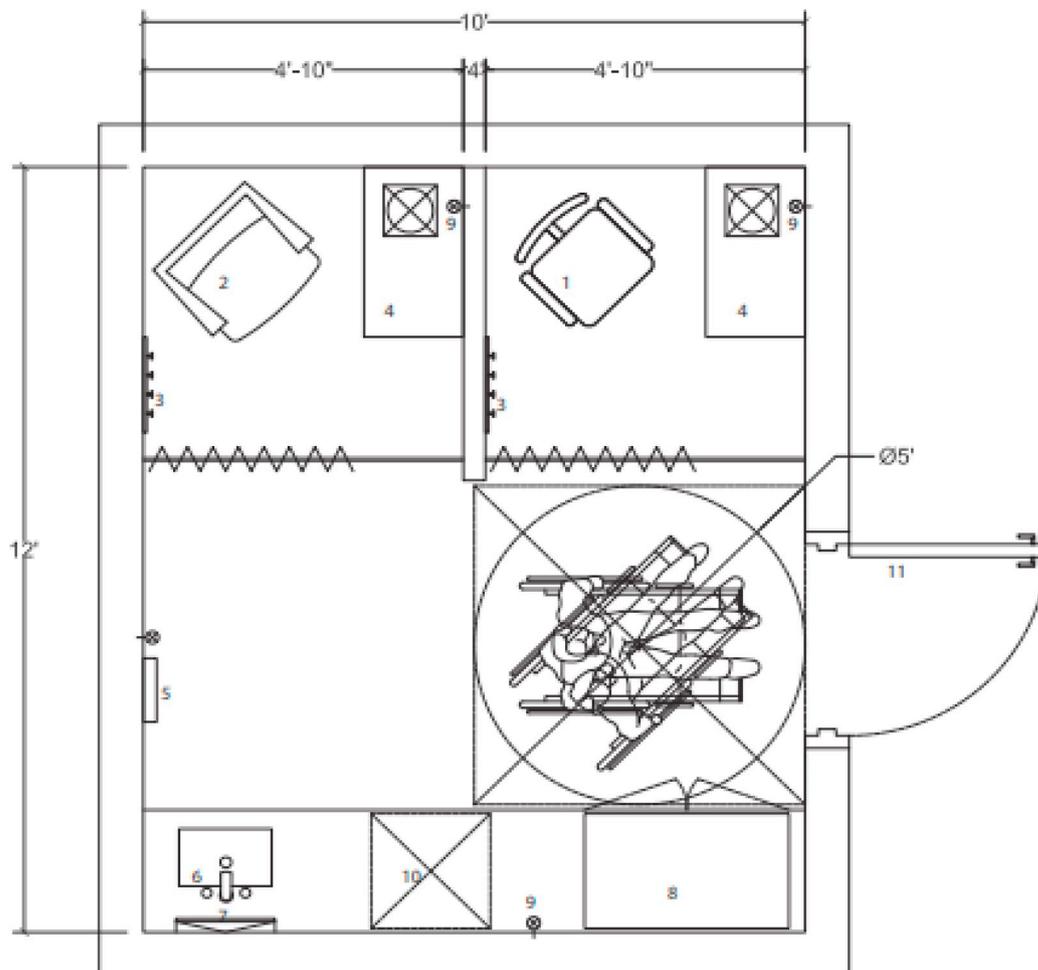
Architectural plan of lactation room from AIA Wellness Room Best Practice [13].
